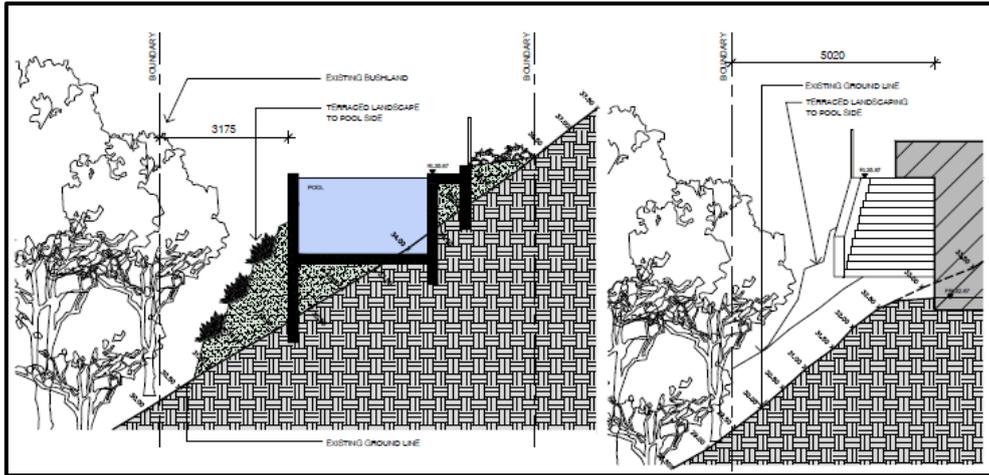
Excerpt of additional sections noting the proposed terraced landscaping as an alternative to the soil fill
